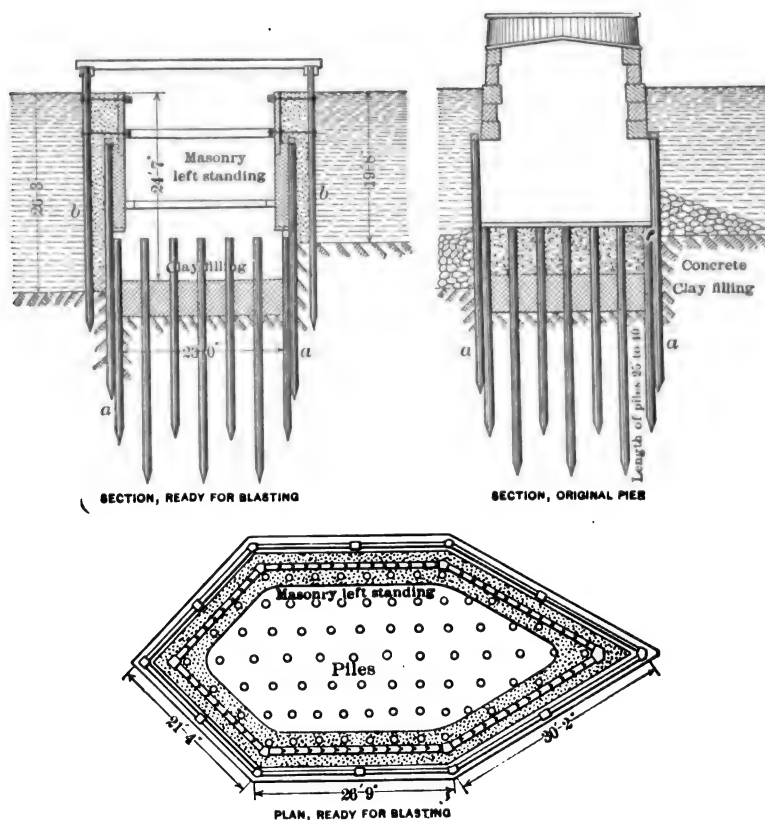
REMOVAL OF MASONRY PIER AT STETTIN, GERMANY.
